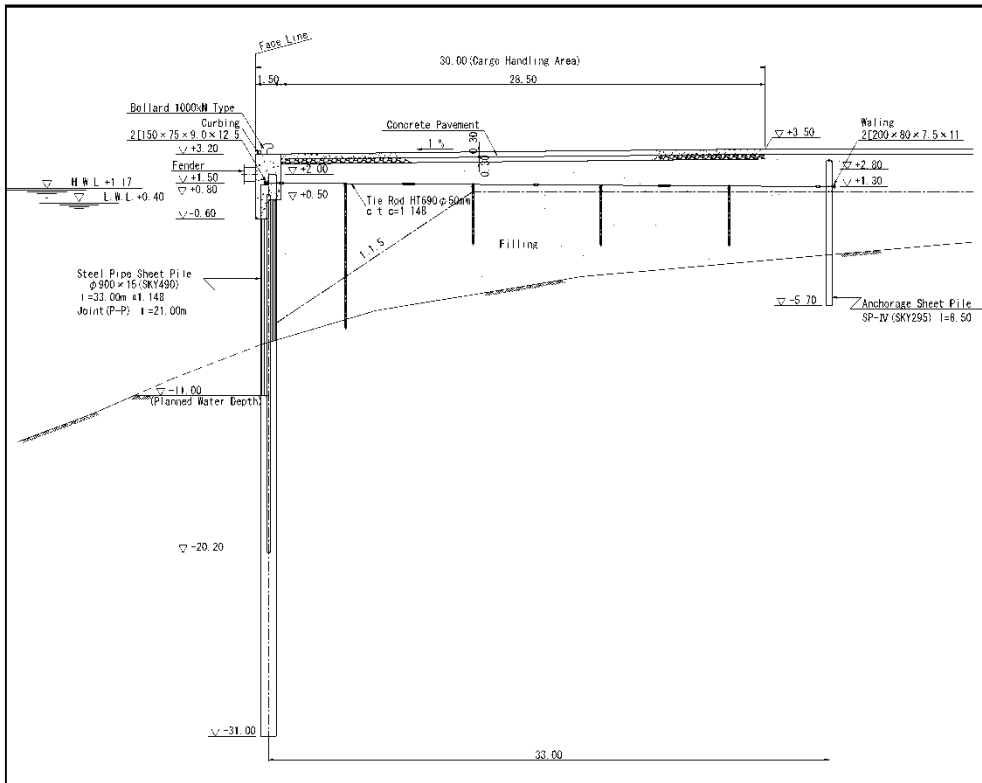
Cross Section of Steel Pipe Sheet Pile Type Wharf
